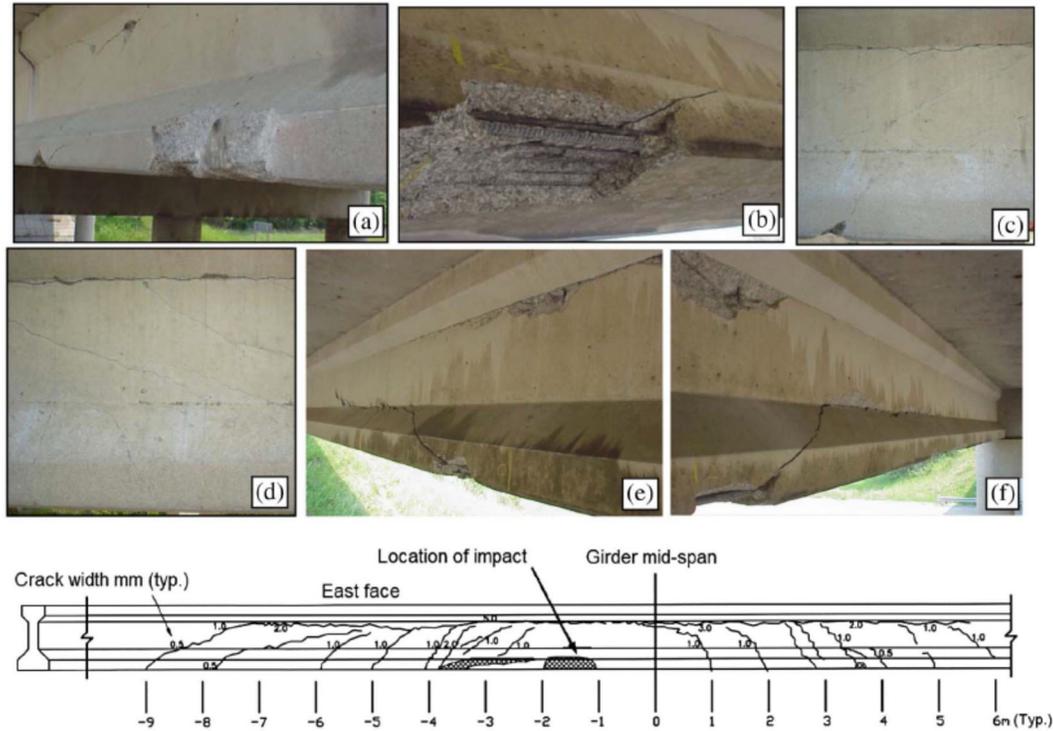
Cracking pattern of the PC girder damaged by overheight vehicle impact: (a) impact face at the bottom flange (b) back side of the bottom flange at the impact point (c) and (d) diagonal cracks on the left and right sides of the impact point, respectively (e) and (f) visible cracks on the left and right sides of the impact point at the back face of the girder, respectively [12]
